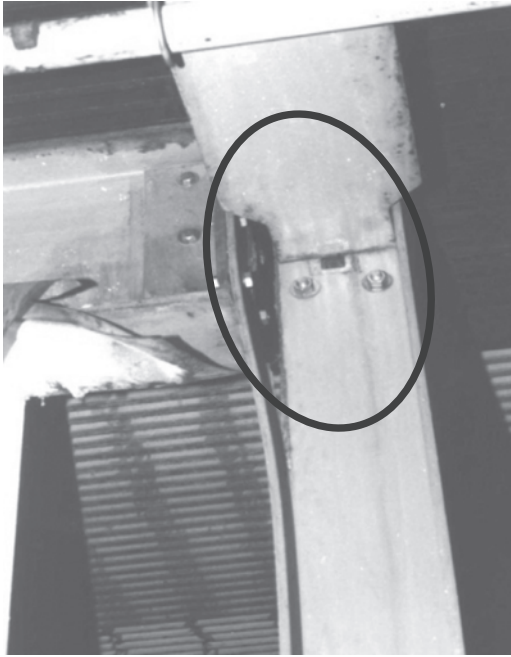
Column local failure initiated at the web-flange junction.
